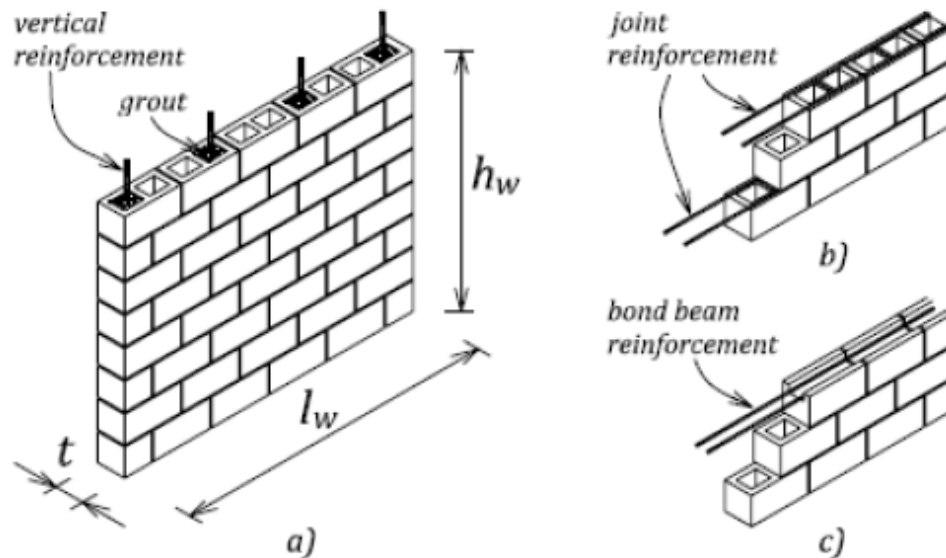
Typical PG masonry wall showing: (a) vertical reinforcement, (b) joint reinforcement and (c) bond beam reinforcement (Anderson and Brzev, 2009)
